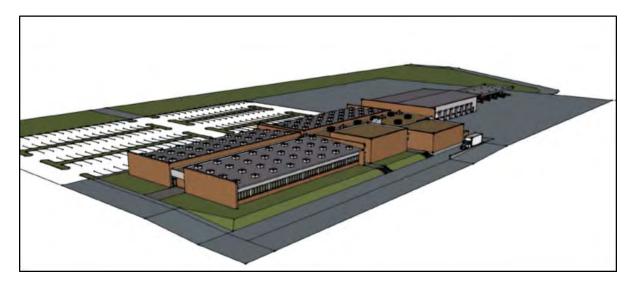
View 2 – Conceptual Perspective Drawing of the Proposed Facility
